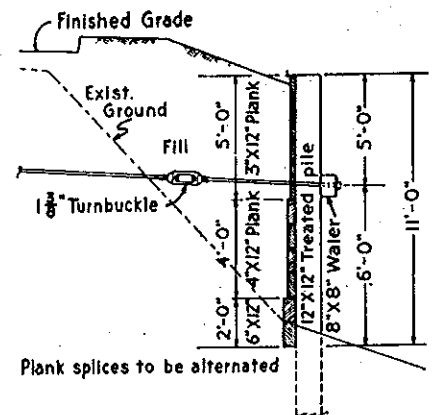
Section of pressure treated wall built by the Oregon State Highway Commission showing tieback rod and turnbuckle.
